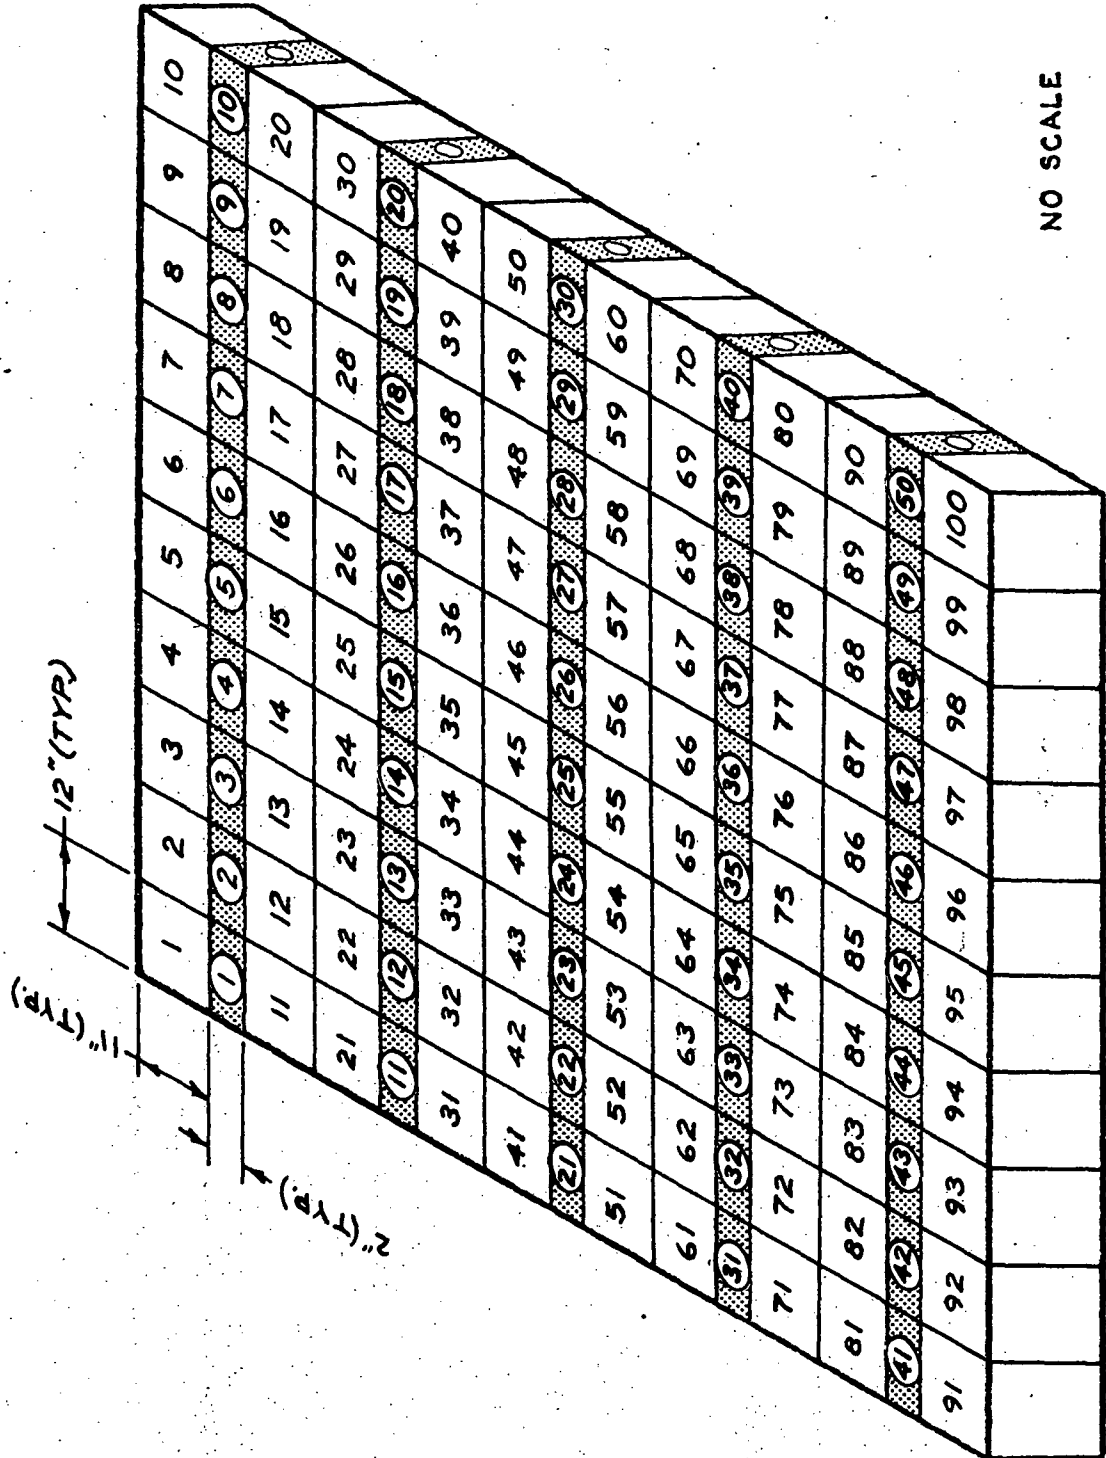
RECTANGULAR PANEL EXAMPLE PROBLEM - OVERALL DIMENSIONS
